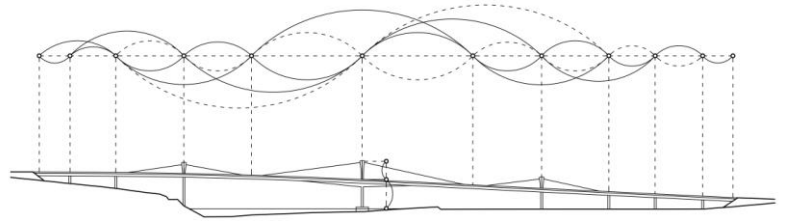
The Golden Proportions of the N25 River Barrow Crossing, now called the Rose Fitzgerald Kennedy Bridge. Drawn by G Baird.
